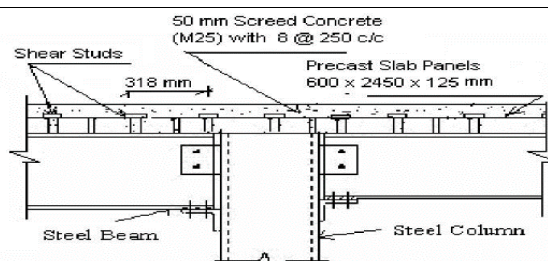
Section of Steel Frame Beam Slab Panel with Precast Concrete Floor
